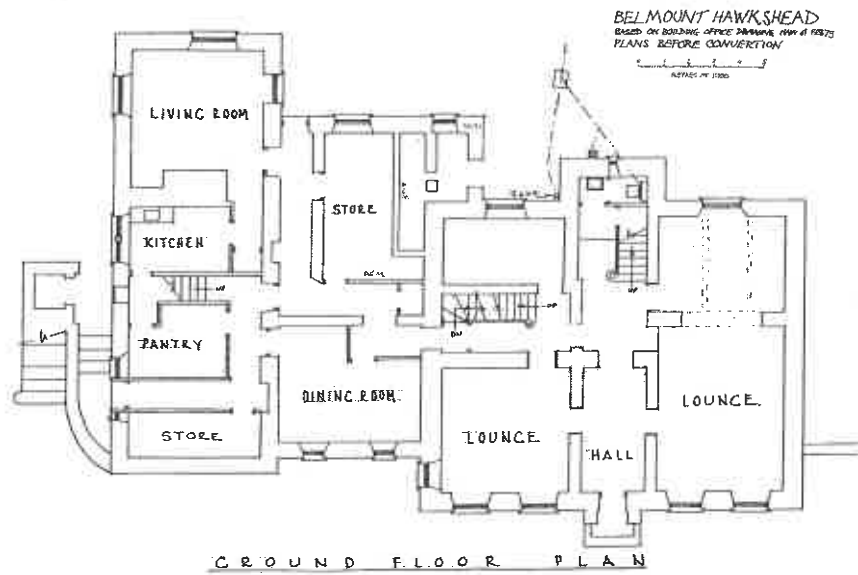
1979 ground-floor plan of Belmont (National Trust)
